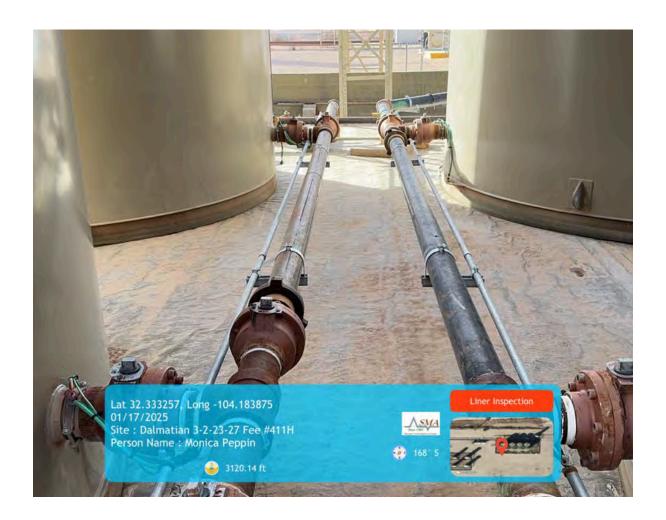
Liner view of south area of containment from southwest corner facing east.
